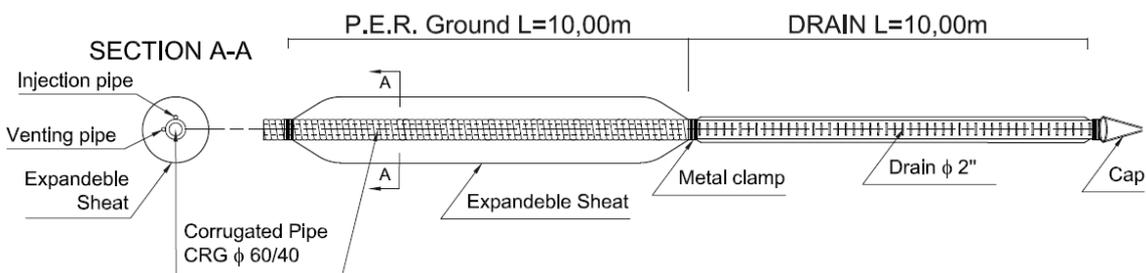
Soil nail for the coupled tunnel face reinforcement and drainage, as a modification of PERGround® shown in Figure 3
